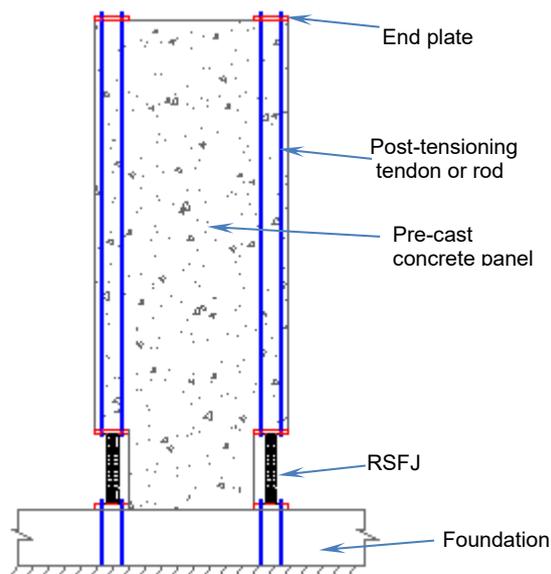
different components of the proposed rocking pre-cast concrete wall system
